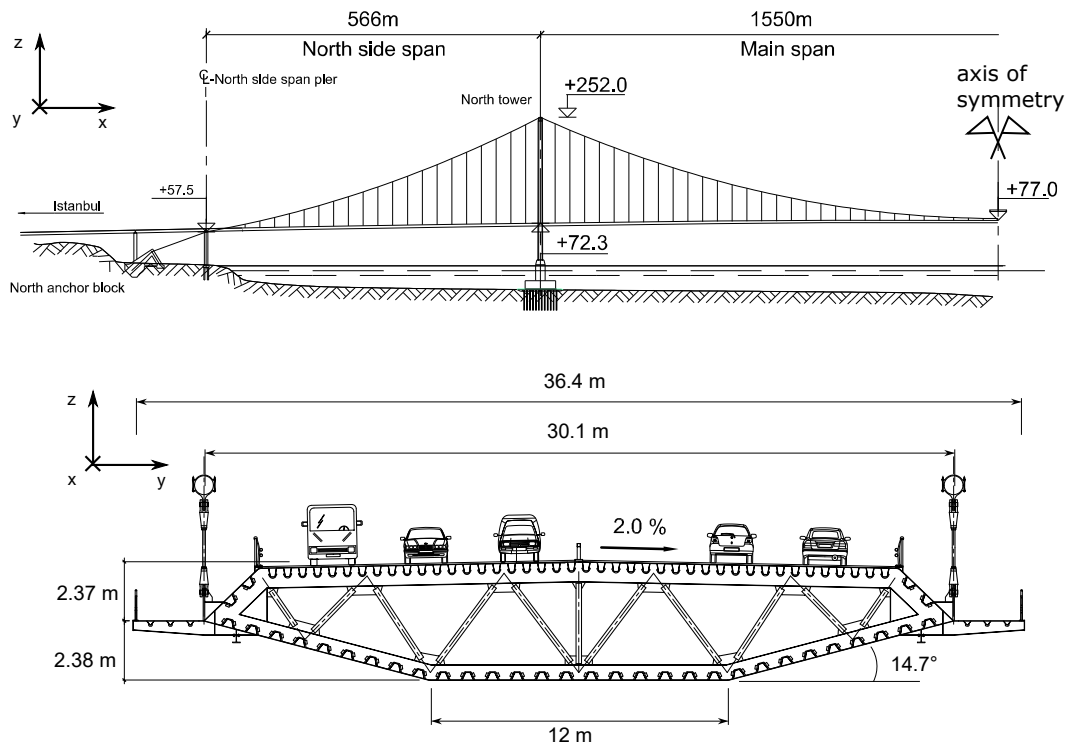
General arrangement of the bridge (the bridge is symmetric and only half of the complete bridge is shown) and typical deck cross-section
